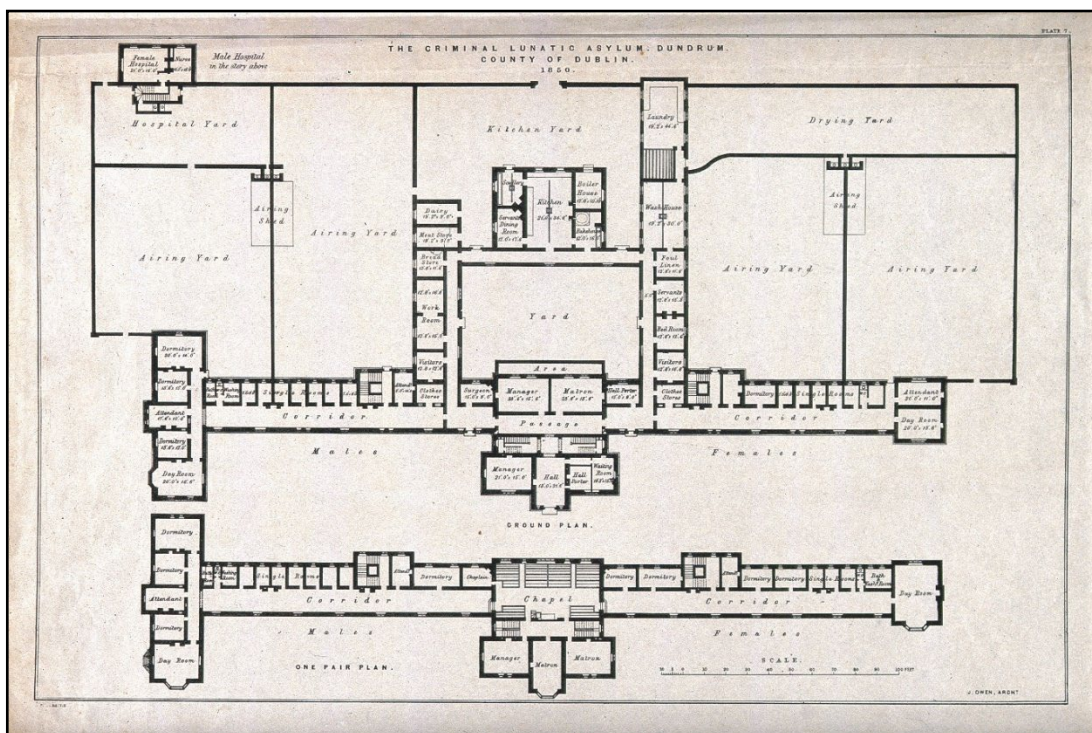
1850, Engraving of Floor Plan and Annotated Layout, Jacob Owen Architect.
